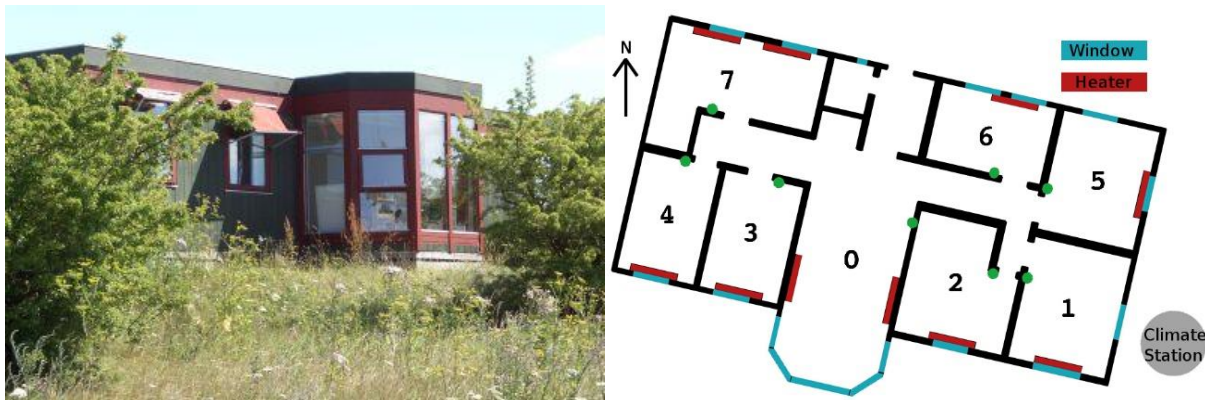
(left) View from the south side of FlexHouse and (right) Floorplan: The green dots indicate the position of the wall-mounted temperature measurements.
